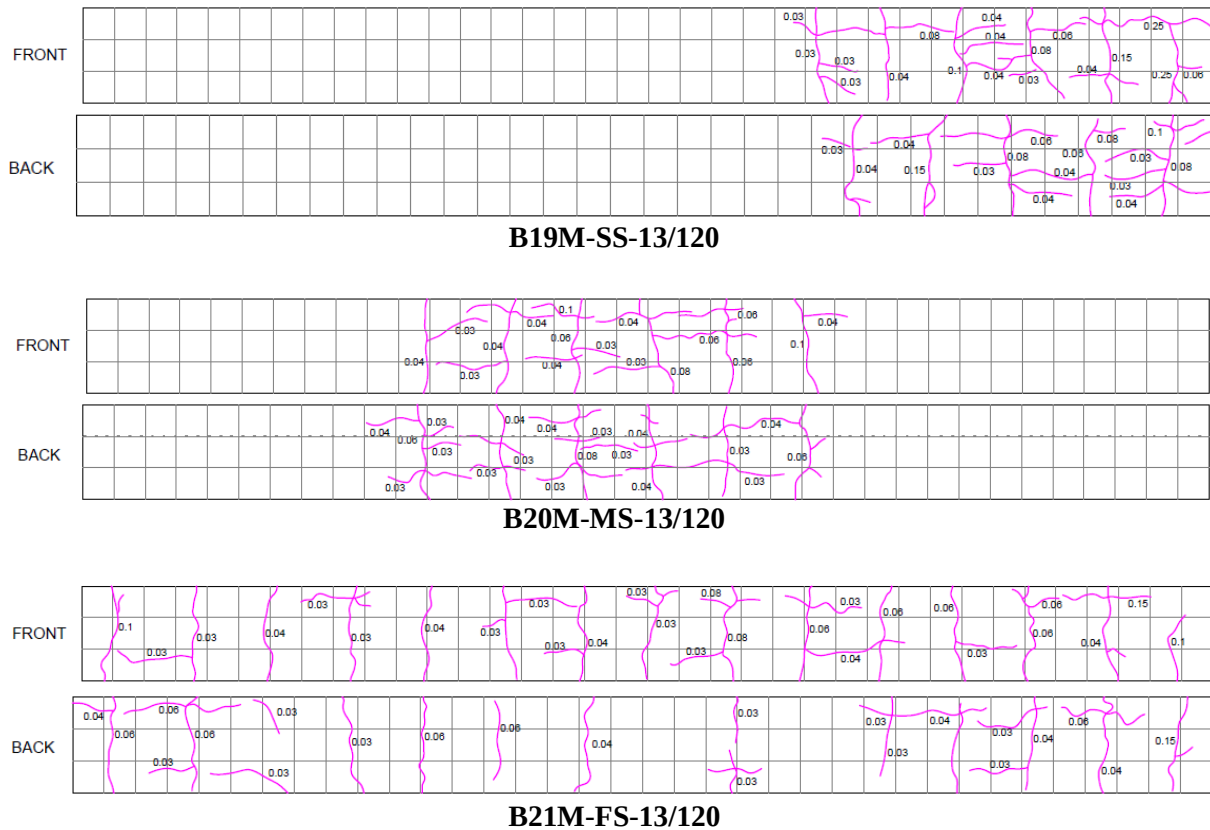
Corrosion cracks distribution of D13, 120 mm beams mildly corroded
